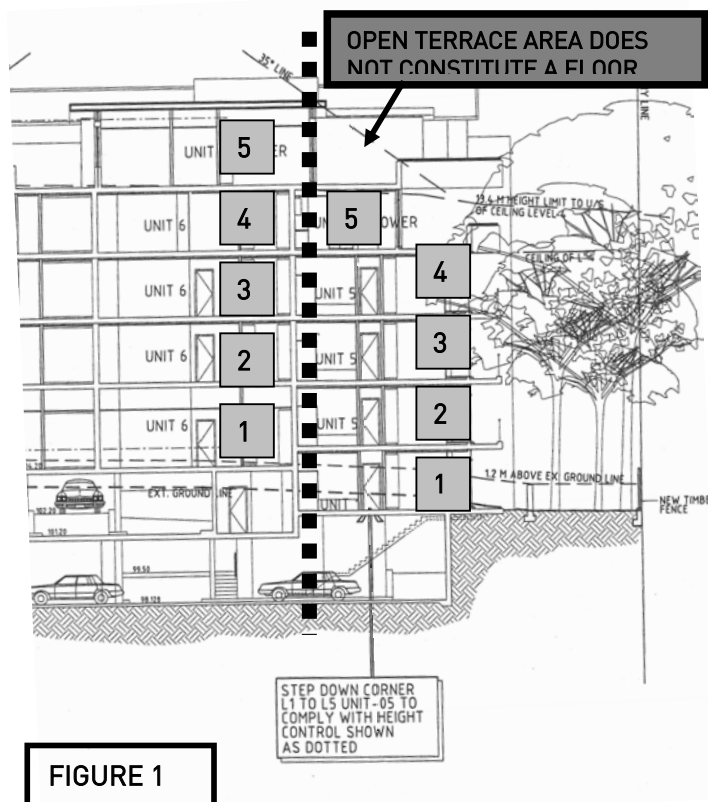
is a section of the proposal and illustrates more clearly than the elevation that the building does not have a 6 storey component. The basement level unit is not overlapped by a top floor unit and the roof area directly above it (on the top level) is utilised as an open terrace area with no roof.
